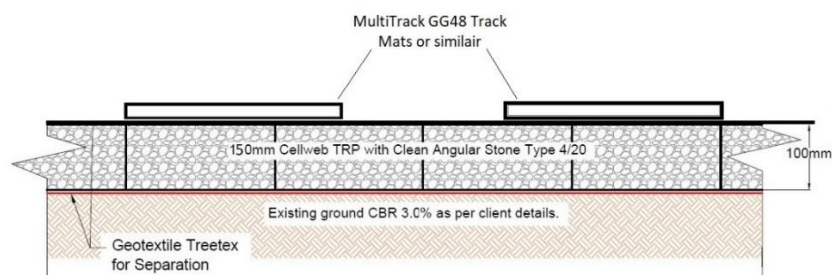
Cross section of temporary surface treatment to Cellweb construction
